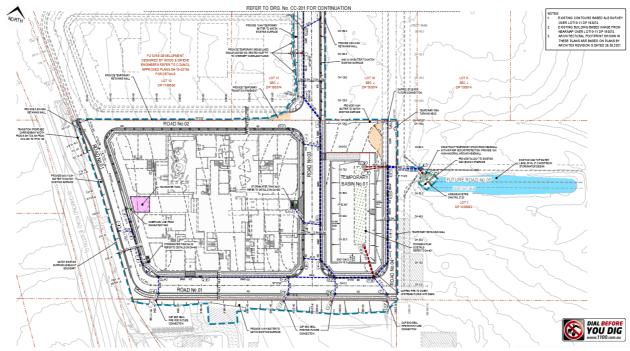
Engineering Plan by Orion (Refer Sheet 200 and 201 in Revision C plans)
